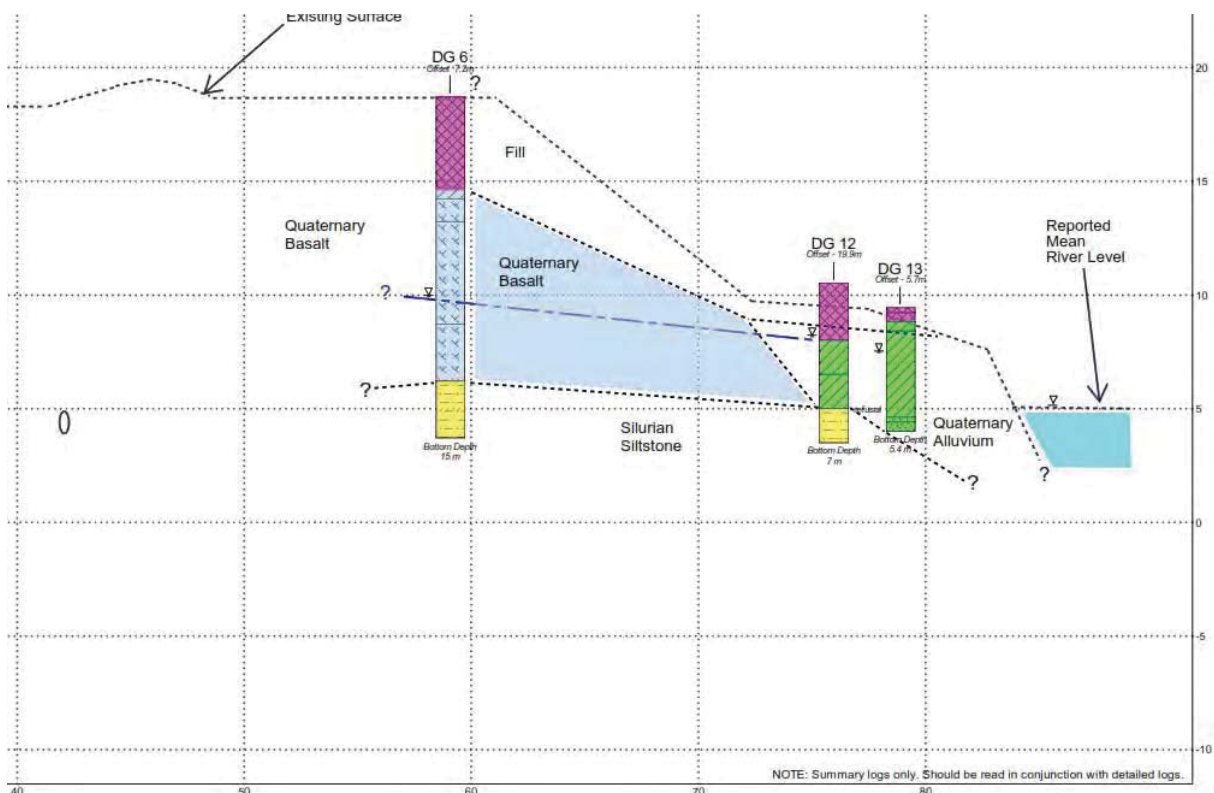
Cross Section C-2 Extract (see Appendix B for full cross section drawing)
